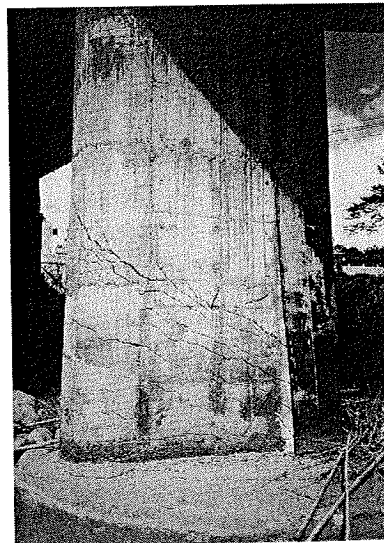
Damage to Pier P1 on the Cholan-bound lane
